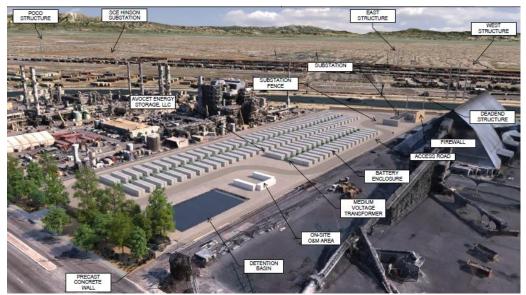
Northeast Aerial View of Site and Project-Related Off-Site Improvements
